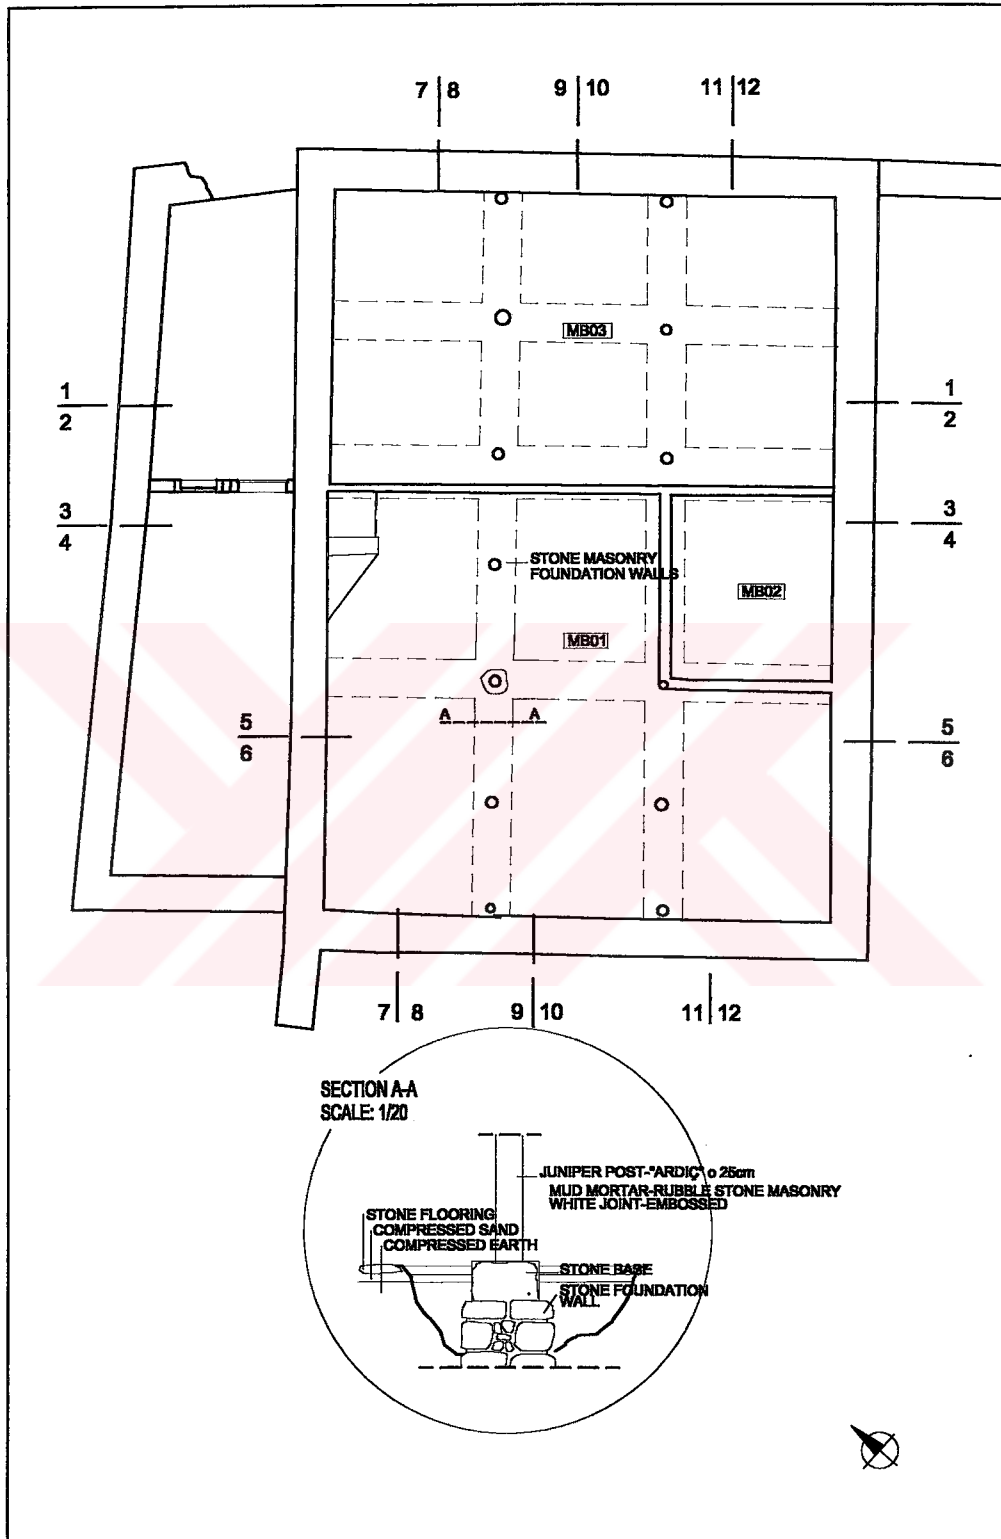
Reflected Ceiling Plan Of Basement Floor
